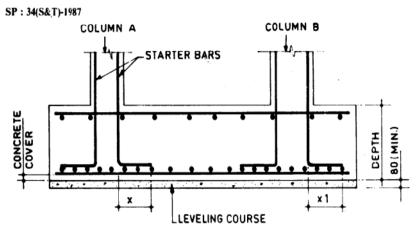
Typical Section for Column Reinforcement as per SP34-1987
